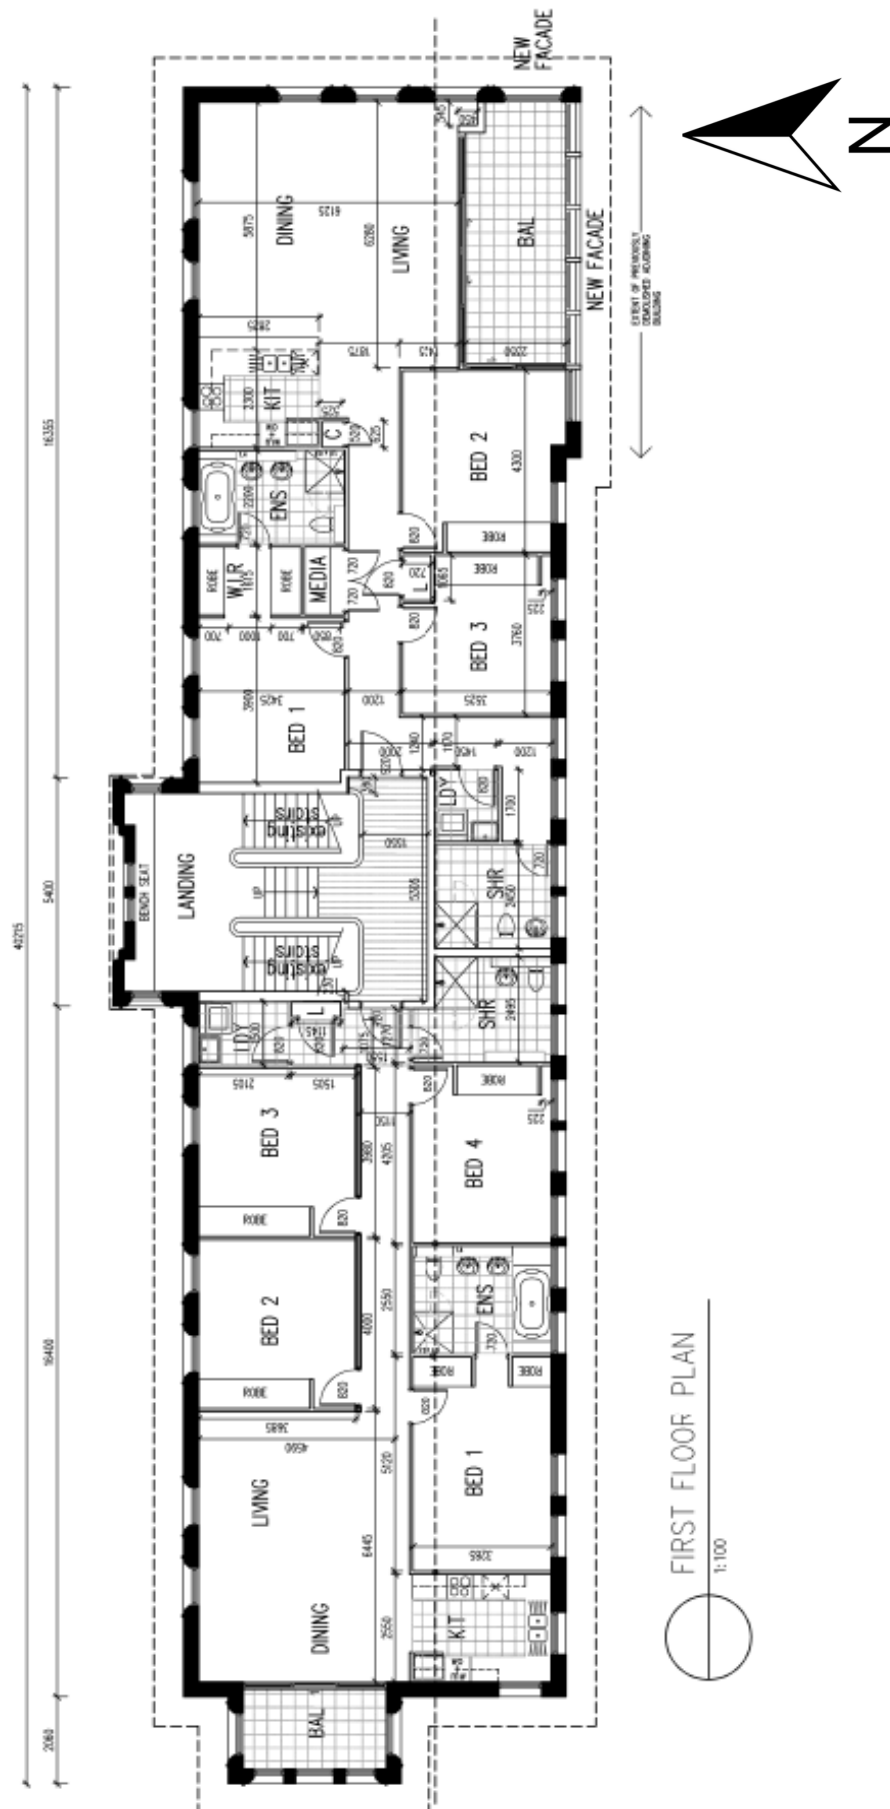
Proposed first floor plan. The proposal is for 1 x 3 bedroom unit and 1 x 4 bedroom unit.
